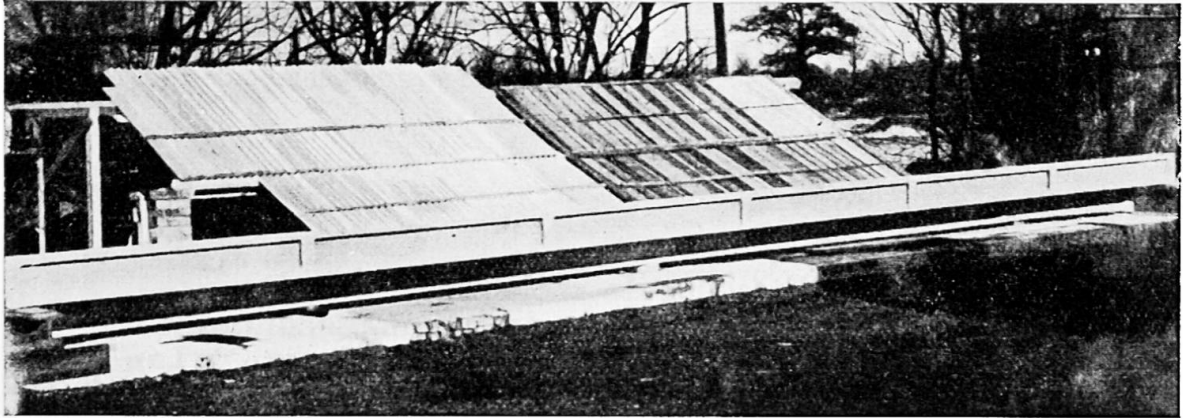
Prestressed concrete joist. Depth-span ratio 1:45.
